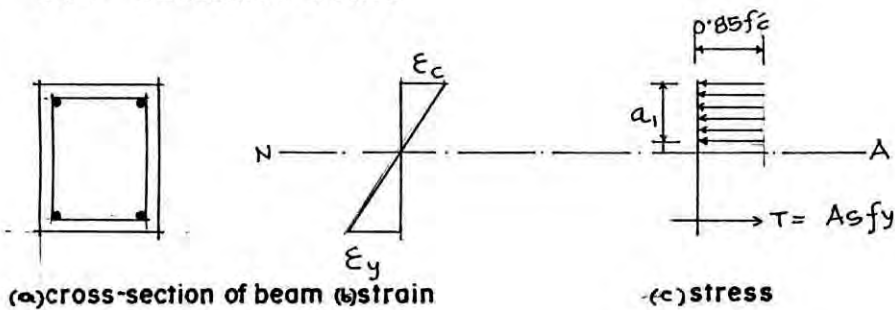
Stress and Strain Distribution of Reinforced Concrete Beam at Ultimate Stage
